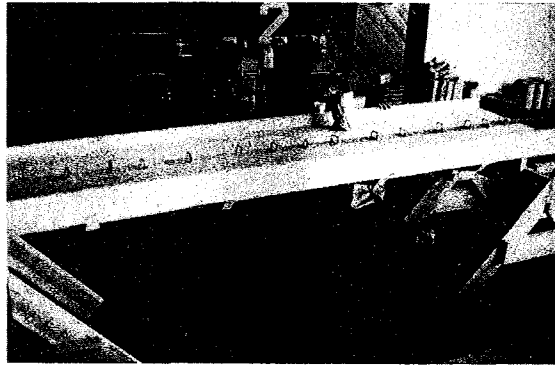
BEAM DETAILS AND LOADING FRAME
